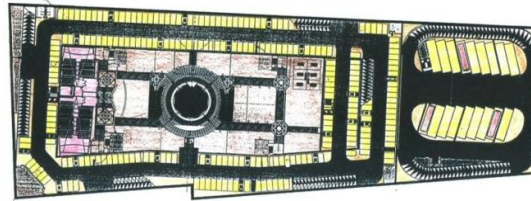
Basement floor plan (-1) of First Underground Garage under Tahrir Square.
